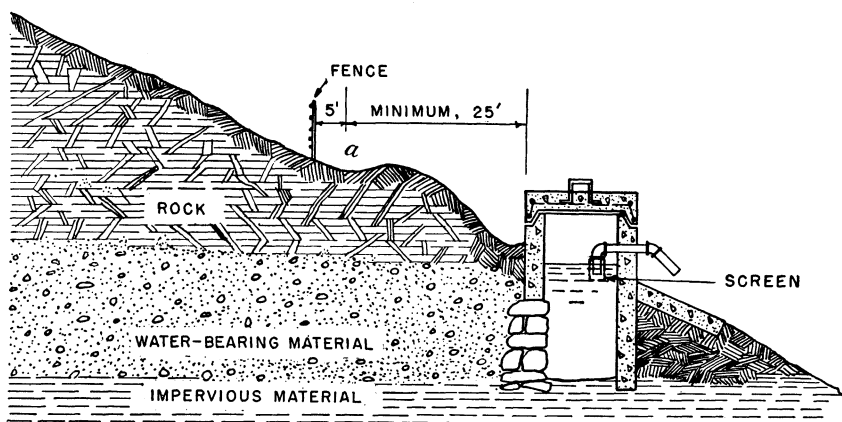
Properly constructed spring. If on ground higher than the buildings, an underground discharge pipe should be provided. Surface water is drained away from the spring by a trench (a).
